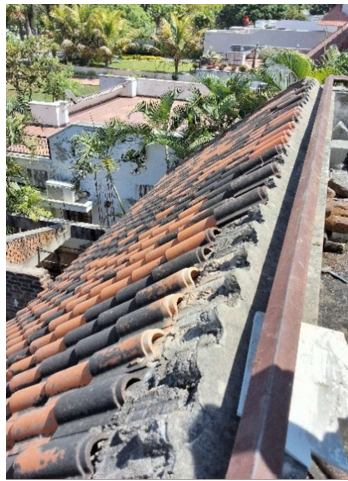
Loosening of Mangalore tiles in the elevation has resulted in water ingress into the slab, leading to further deterioration of the slab.
